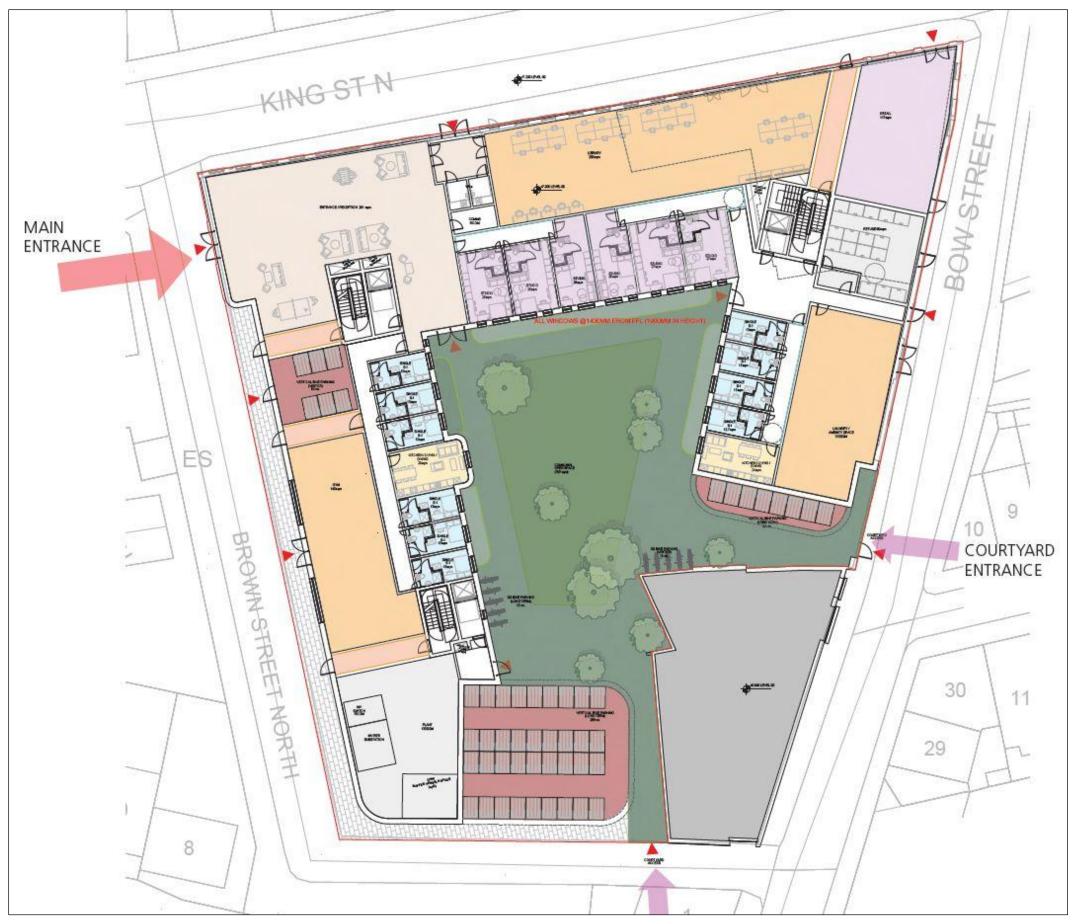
Ground floor plan of proposed development (after MOLA Architecture)
